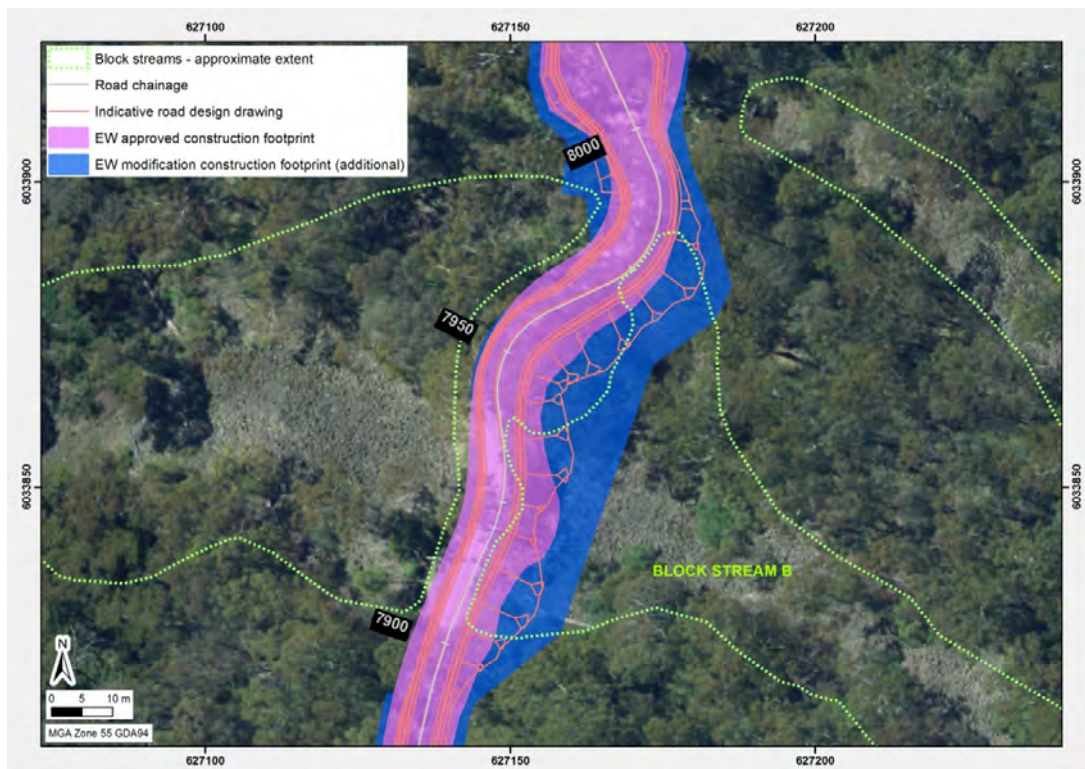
Aerial view of Block Stream B, at Lobs Hole Ravine Road, showing the extent of the proposed additional construction footprint and the indicative road design drawing for this section.
